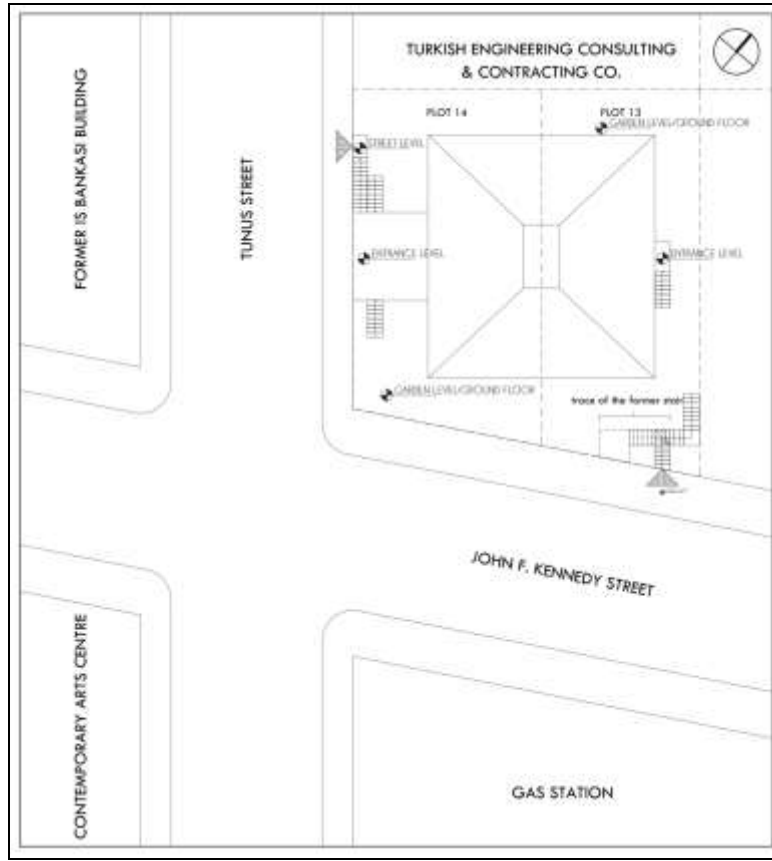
The Bina Site Plan 1/500 (Source: Developed by the author)
